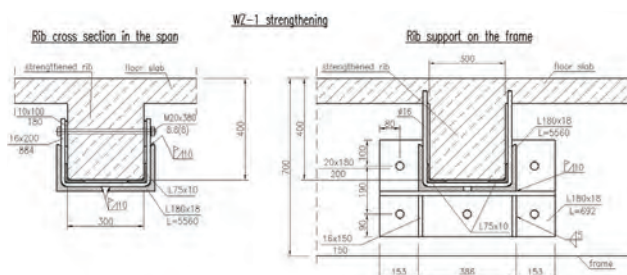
Strengthening WZ-1 of the floor beams of part B at the level of +4.20
